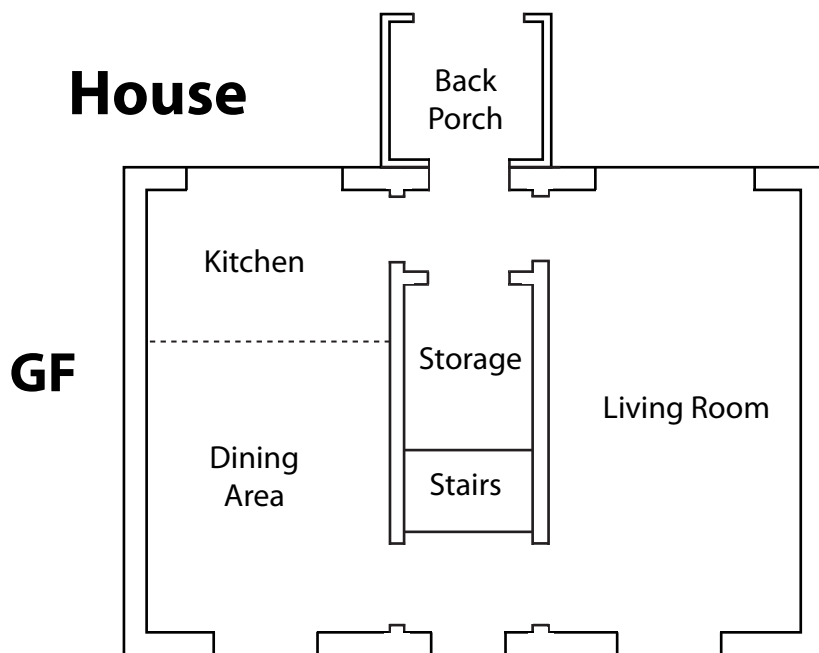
Plan of no. 317 Upton Lane, Widnes, Cheshire. Showing layout of internal rooms. Scale @ 1:100 on A4.
